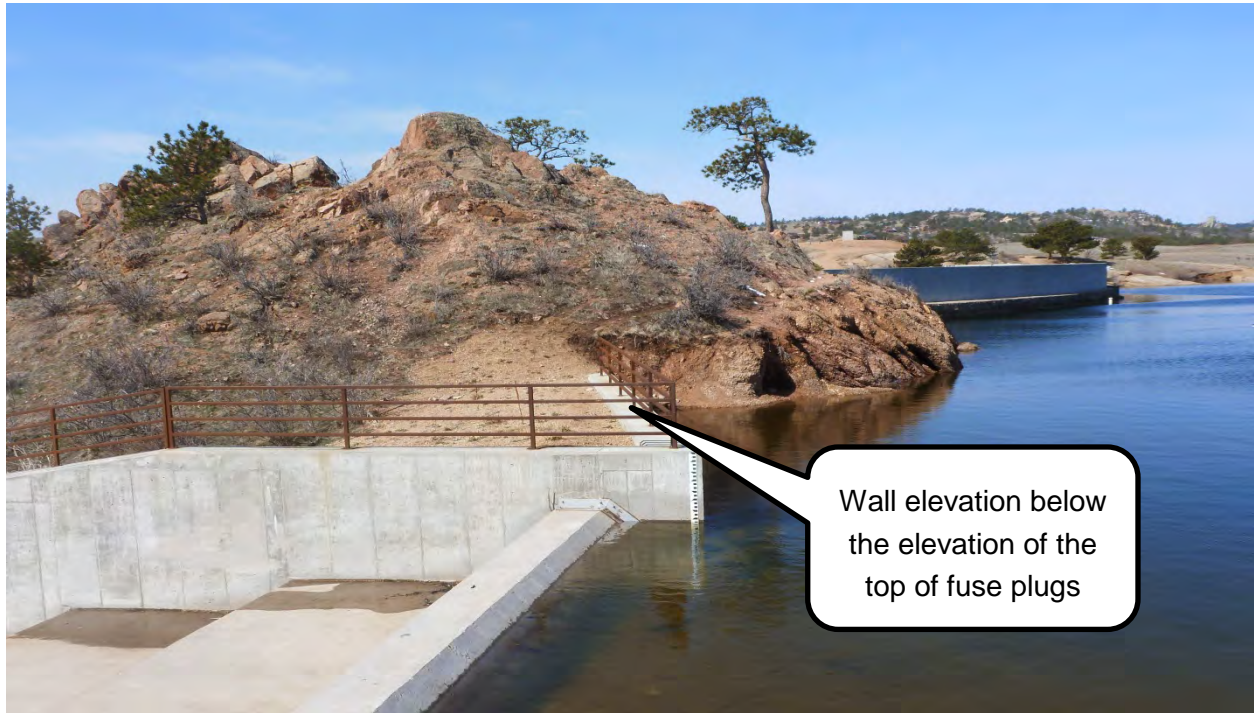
Right abutment of main spillway. Notice that the wall to the right of the spillway is below the elevation of the top of the fuse plugs. (May 6, 2013)
